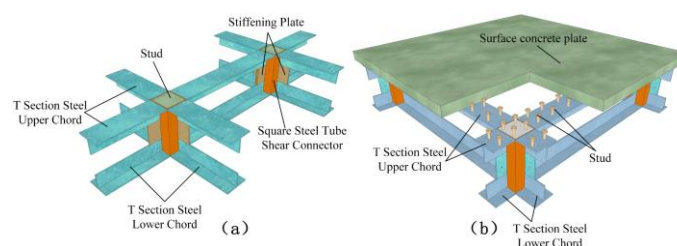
Schematic diagram of the structure of steel-concrete composite hollow sandwich plate
